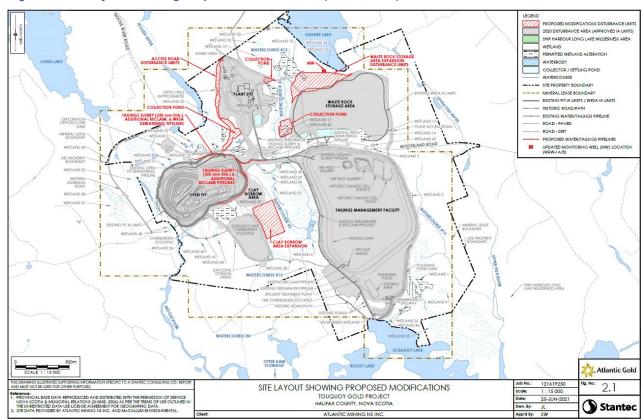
Site Layout Showing Proposed Modifications (AMNS, 2021)
